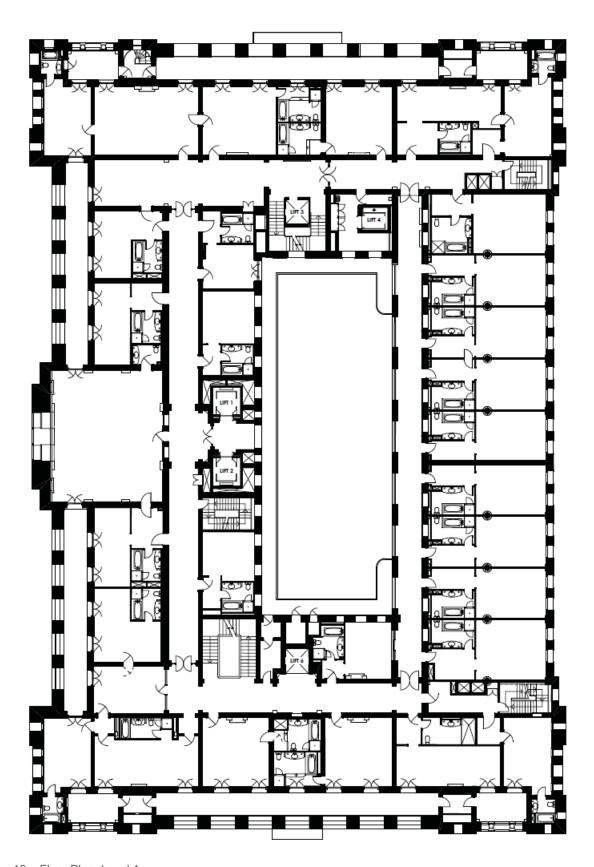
Floor Plan, Level 1 Source: ML Design 2016
